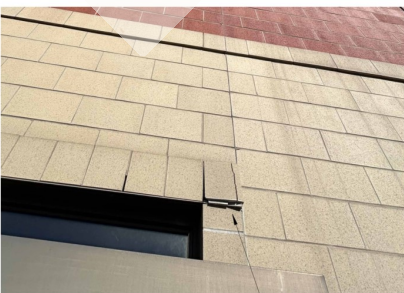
MASONRY FAILURE LOCATED AT DOOR HEADER
